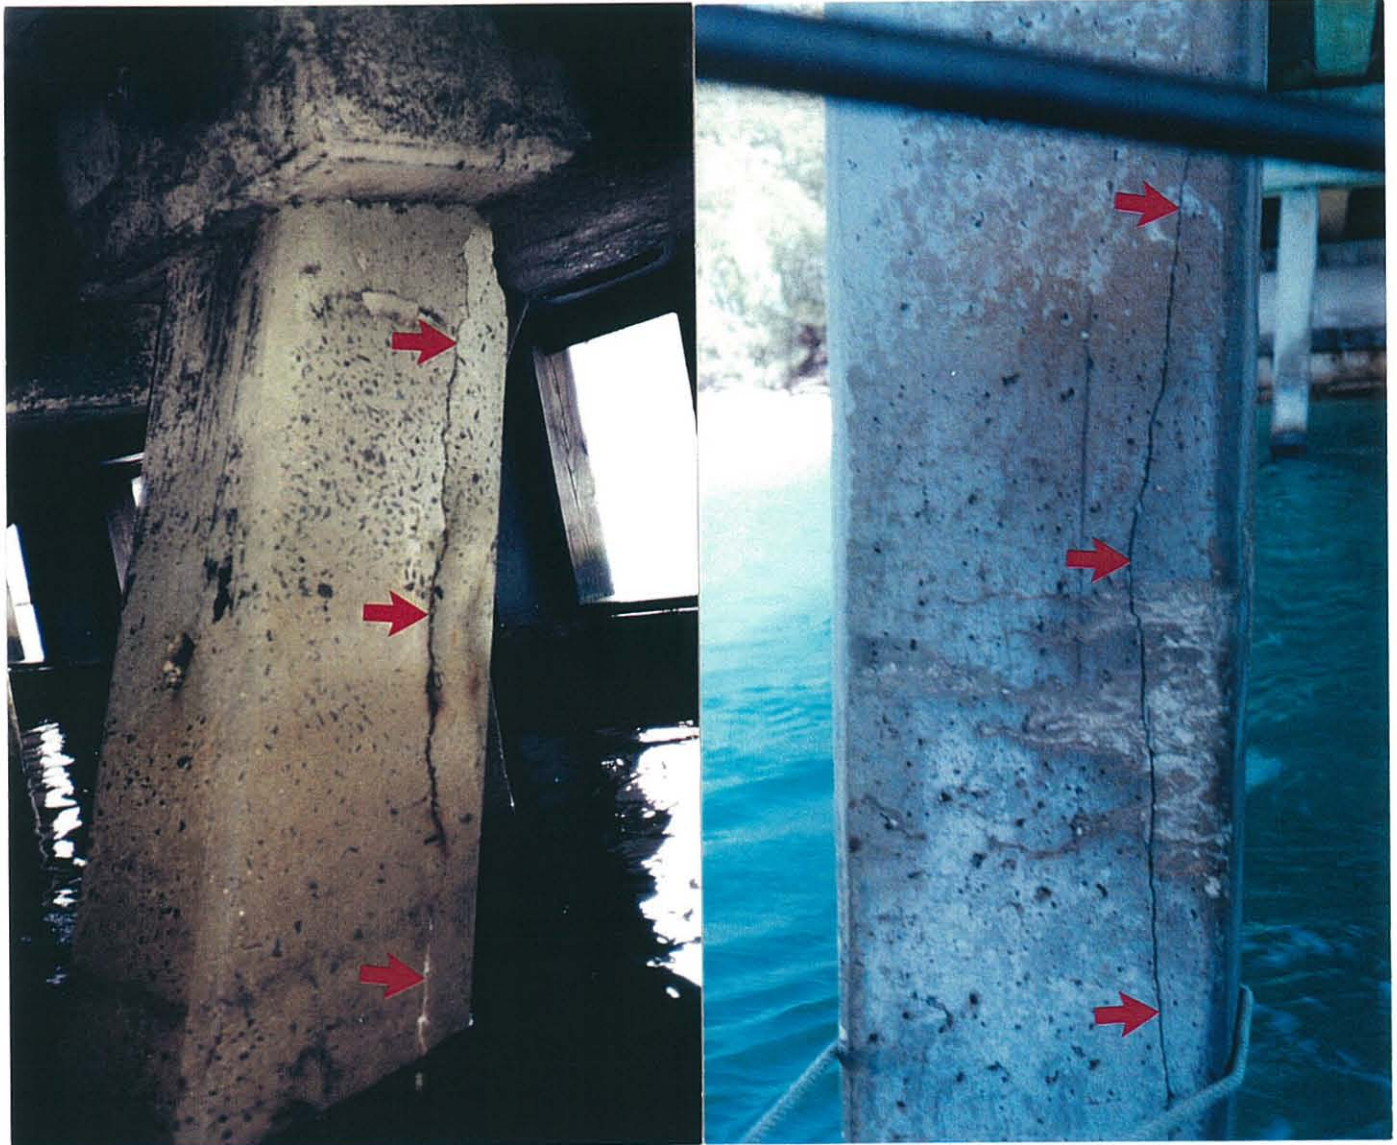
Corner corrosion cracks: non-prestressed square batter pile (left); prestressed square vertical pile (right).
